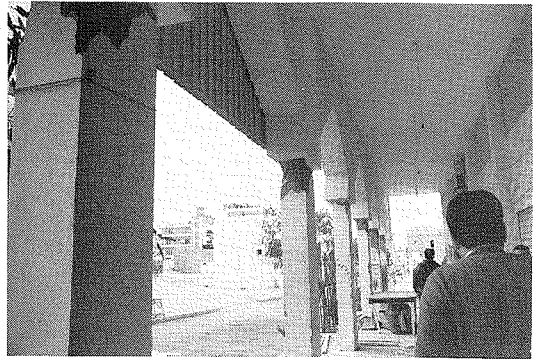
Design with stiffer upper parts supported on weakly braced, relatively long columns which helps give room for shops, lobbies and the like, caused crushing at the tops of the reinforced concrete columns.
